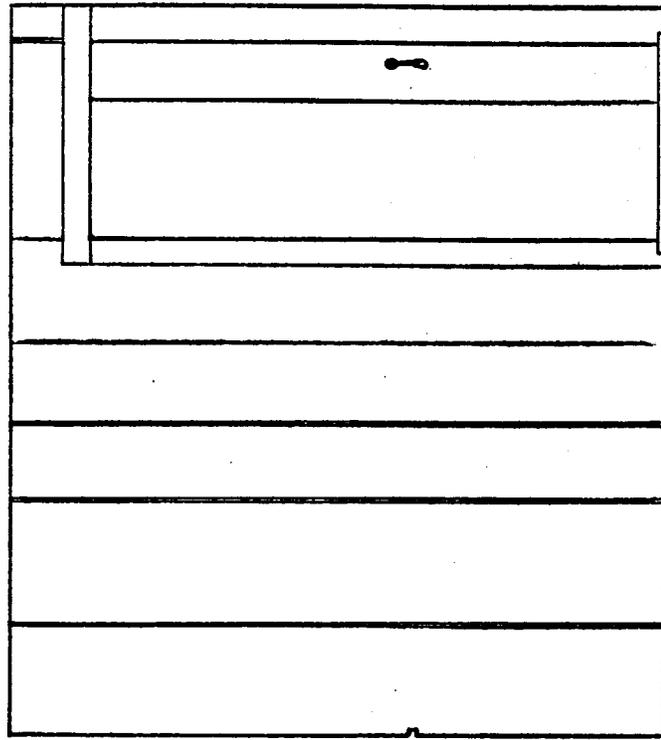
Atwood-Higgins House: West Kitchen, East Wall.
